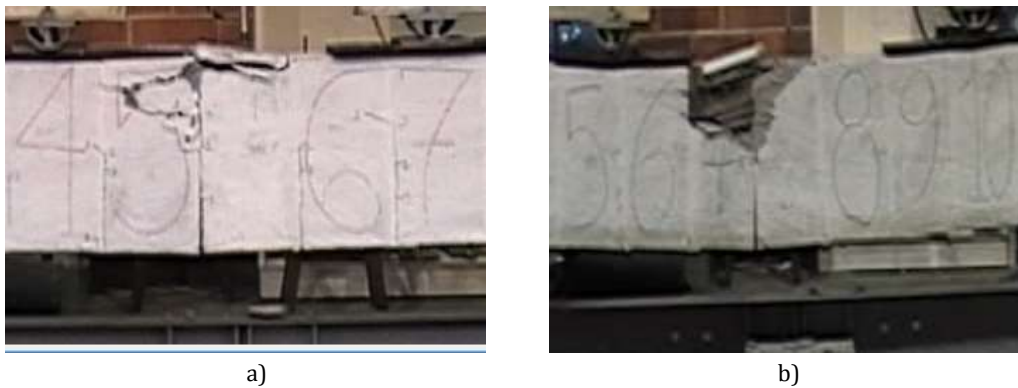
Typical failure mode a) Beam B-10, b) Beam B-21
